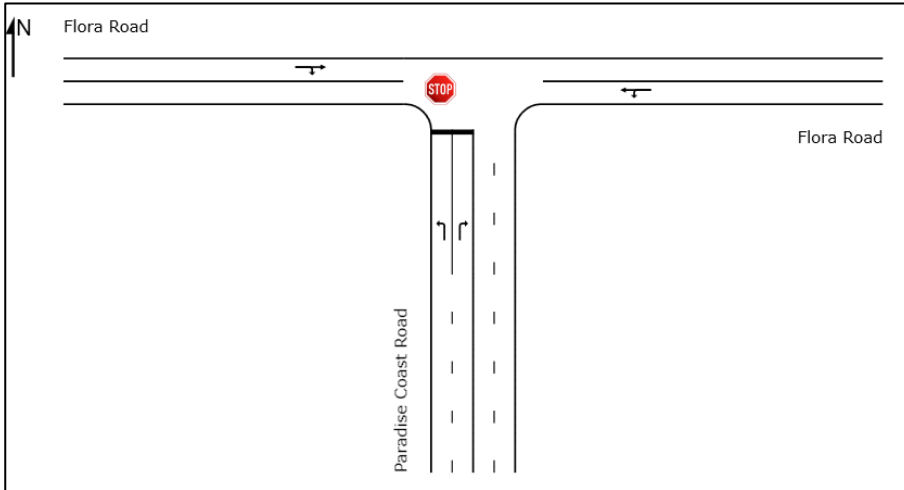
Existing Intersection Layout: Flora Road and Paradise Coast Access
